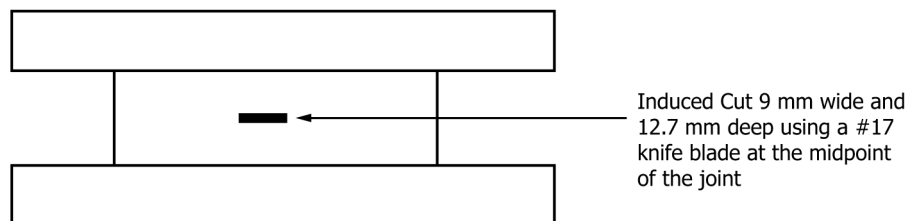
Top View of Joint Showing the Placement of the Induced Cut
